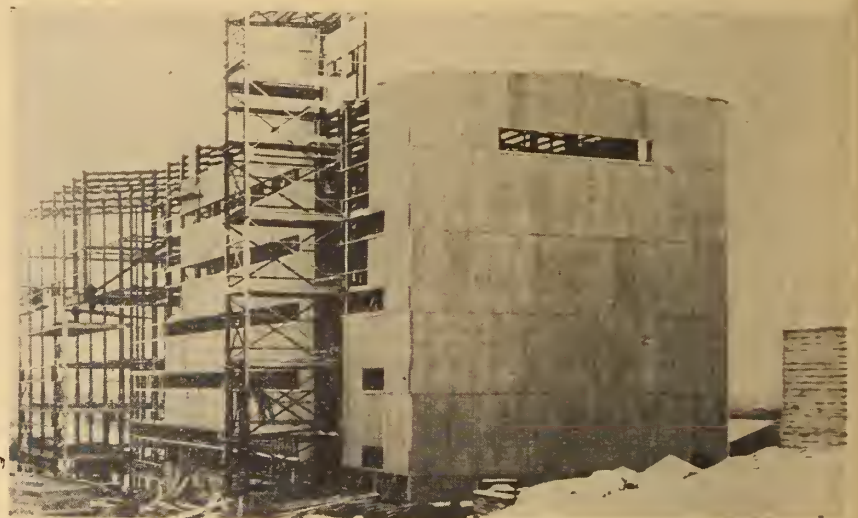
First group of bays with exterior walls of corrugated Transite applied.
